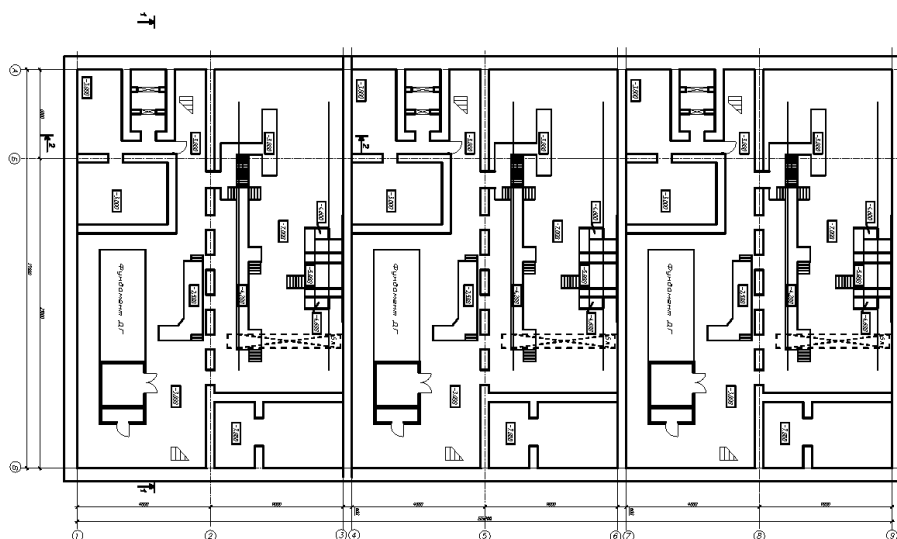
Diesel Generator Building (1DGB-2,3) Plan Elevation -3,000 -7,000
